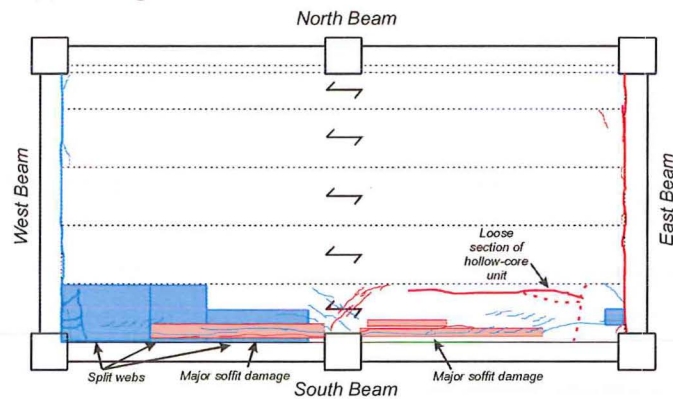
Longitudinal tear that formed within the floor diaphragm at 1.93% drift (Plan view)
